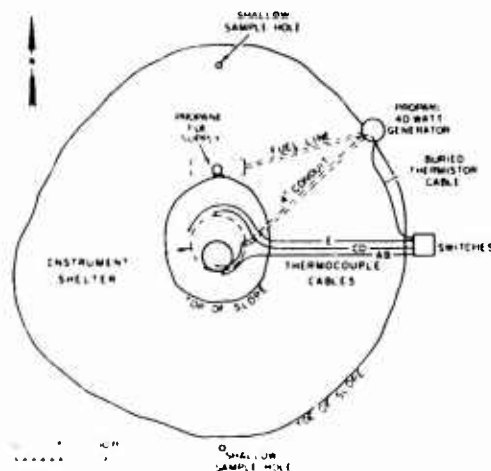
Thermocouple cable layout and shallow sample hole location, June 1966 (plan view).
